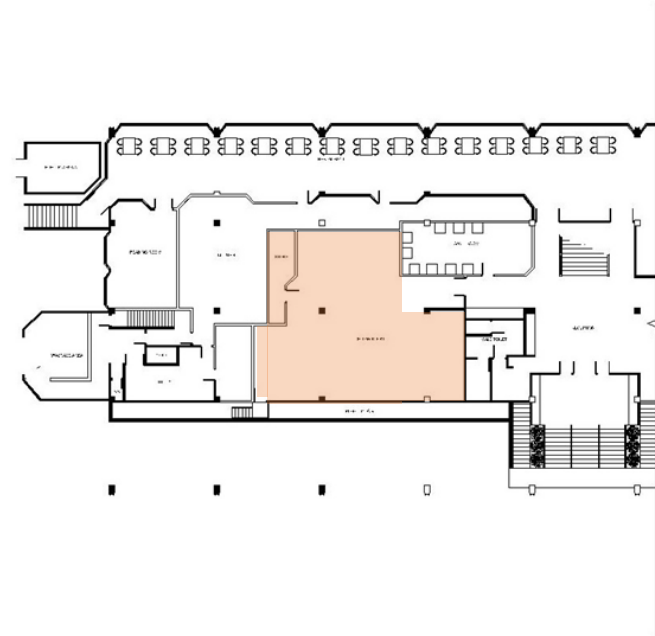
(ab): Layout with highlighted ground floor plan (Lim,2017)
